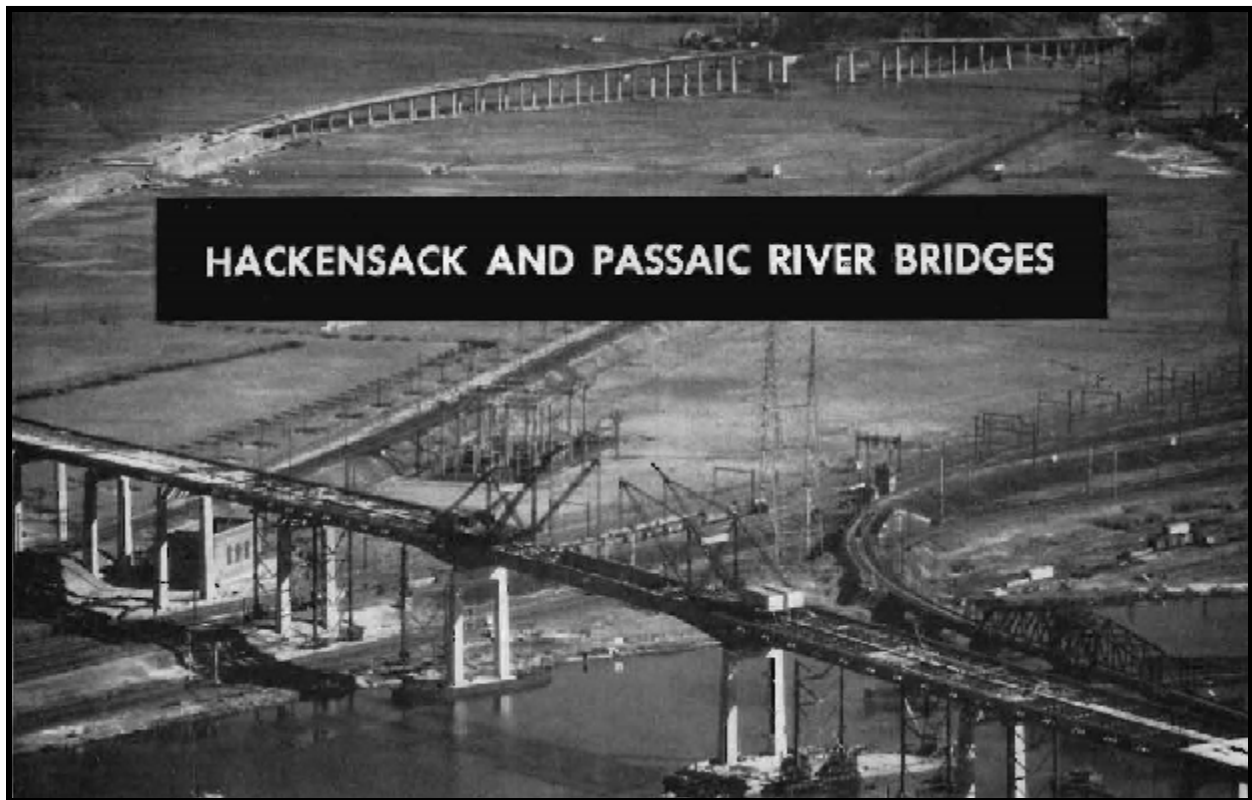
1952 aerial photograph depicting the New Jersey Turnpike's Passaic River and Hackensack River Bridges under construction (Ammann 1952: 60).
